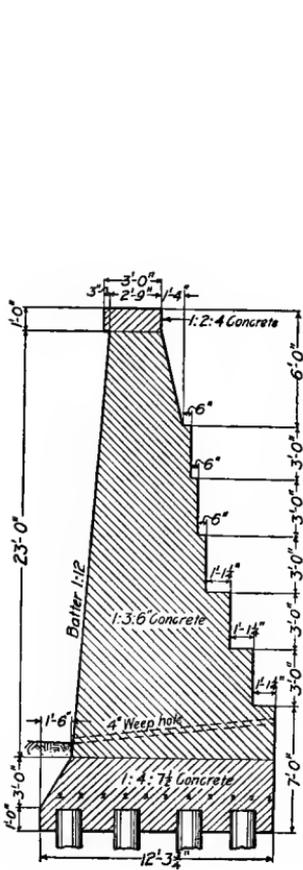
STANDARD RETAINING WALL. N. Y. C. R. R.
